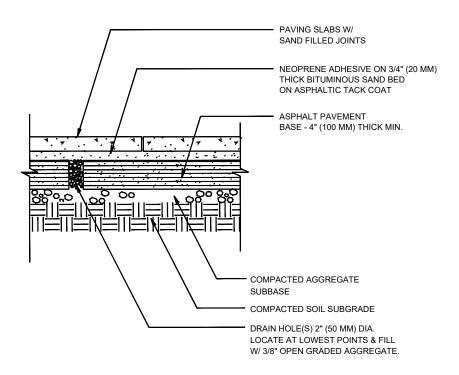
A typical cross section with an asphalt base and bitumen-set paving slabs
